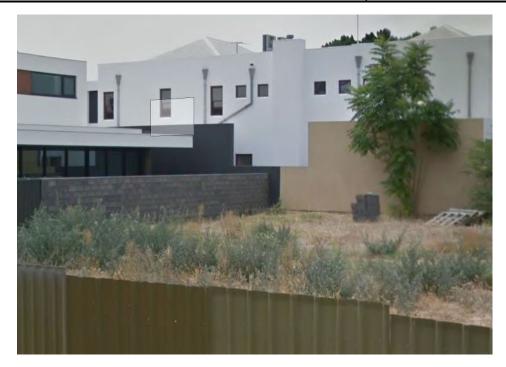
View of the common boundary wall between 3 Mitchell Street, 5 Mitchell Street and 1A Oxford Street. Source: google.com/maps – June 2022
